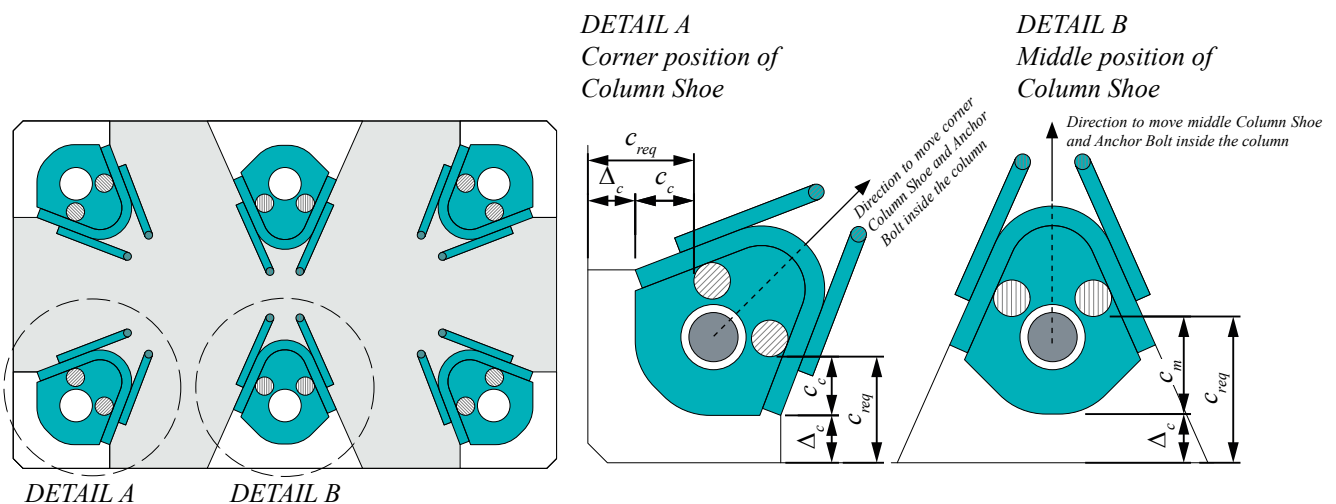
Concrete cover of main anchor bars – determination of required concrete cover thickness c_{req} .
